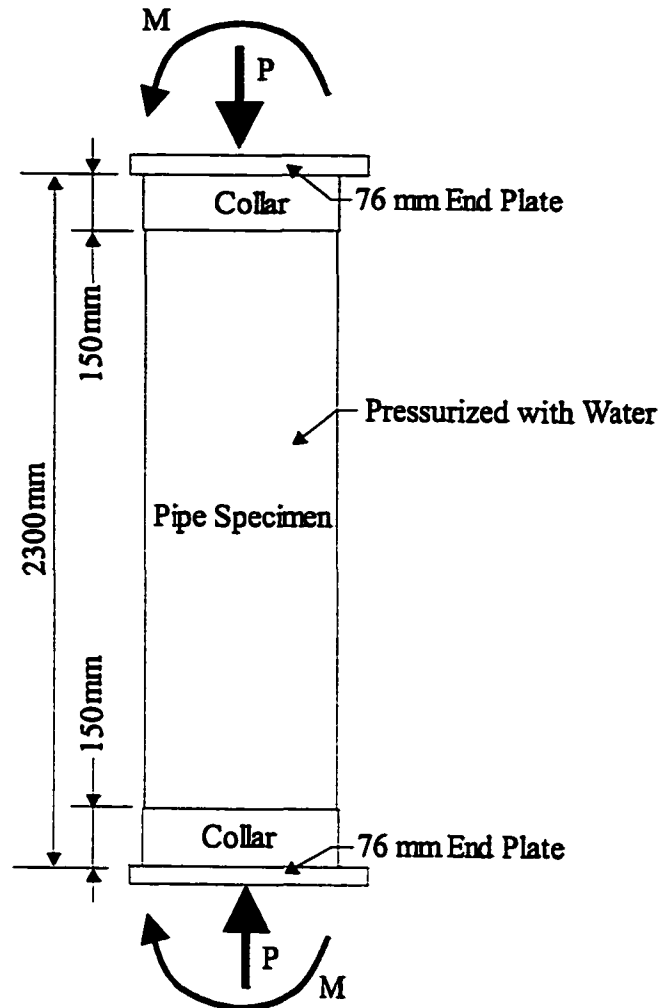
Loading in the machined corroded pipe test.
